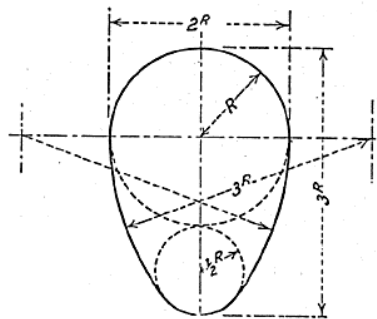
Standard Egg-shaped Section for Brick Sewer.
